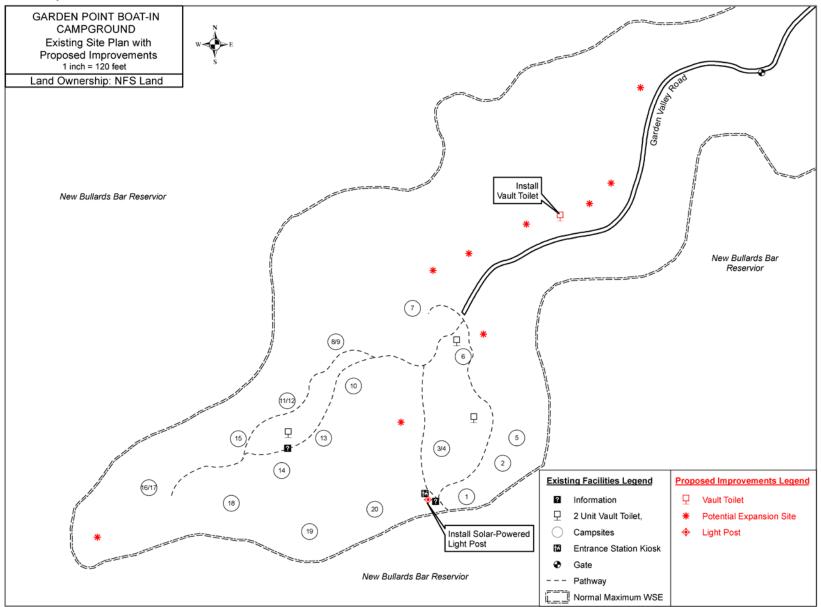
Existing site plan with proposed improvements for Garden Point Boat-in Campground.
